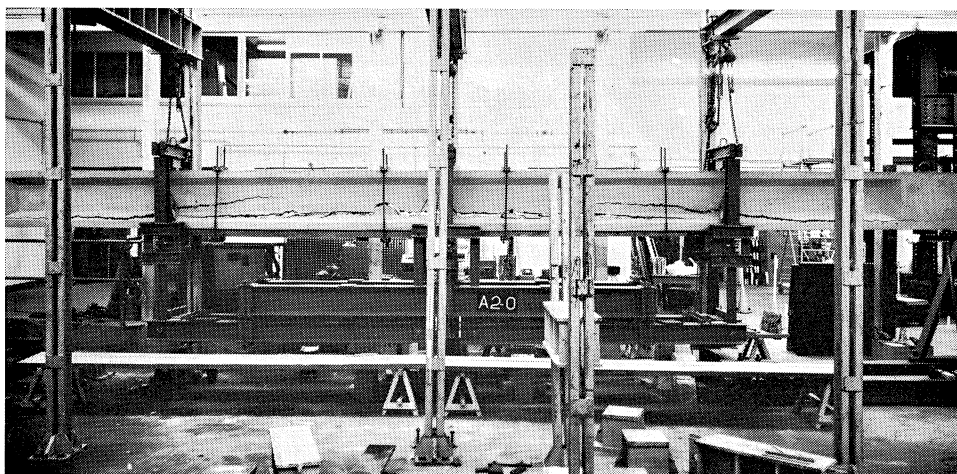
Beam loaded through corbels and containing no stirrups. The photograph shows the condition on reaching the cracking moment.
